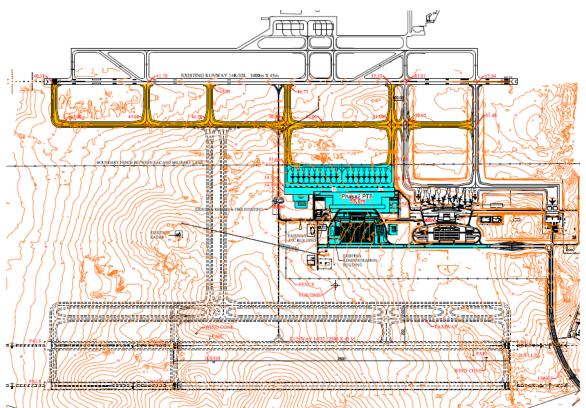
layout of the new terminal final arrangement showing the relation between the Two building
